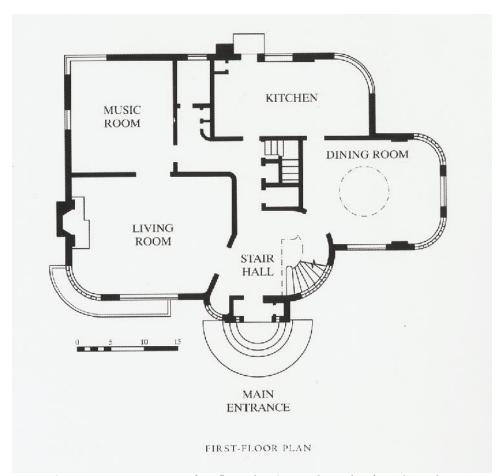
Nixon-Mounsey House first floor plan (First-Floor Plan from Capital Houses: Historic Houses of Washington, D.C., and Its Environs, 1735-1965 by James M. Goode).
